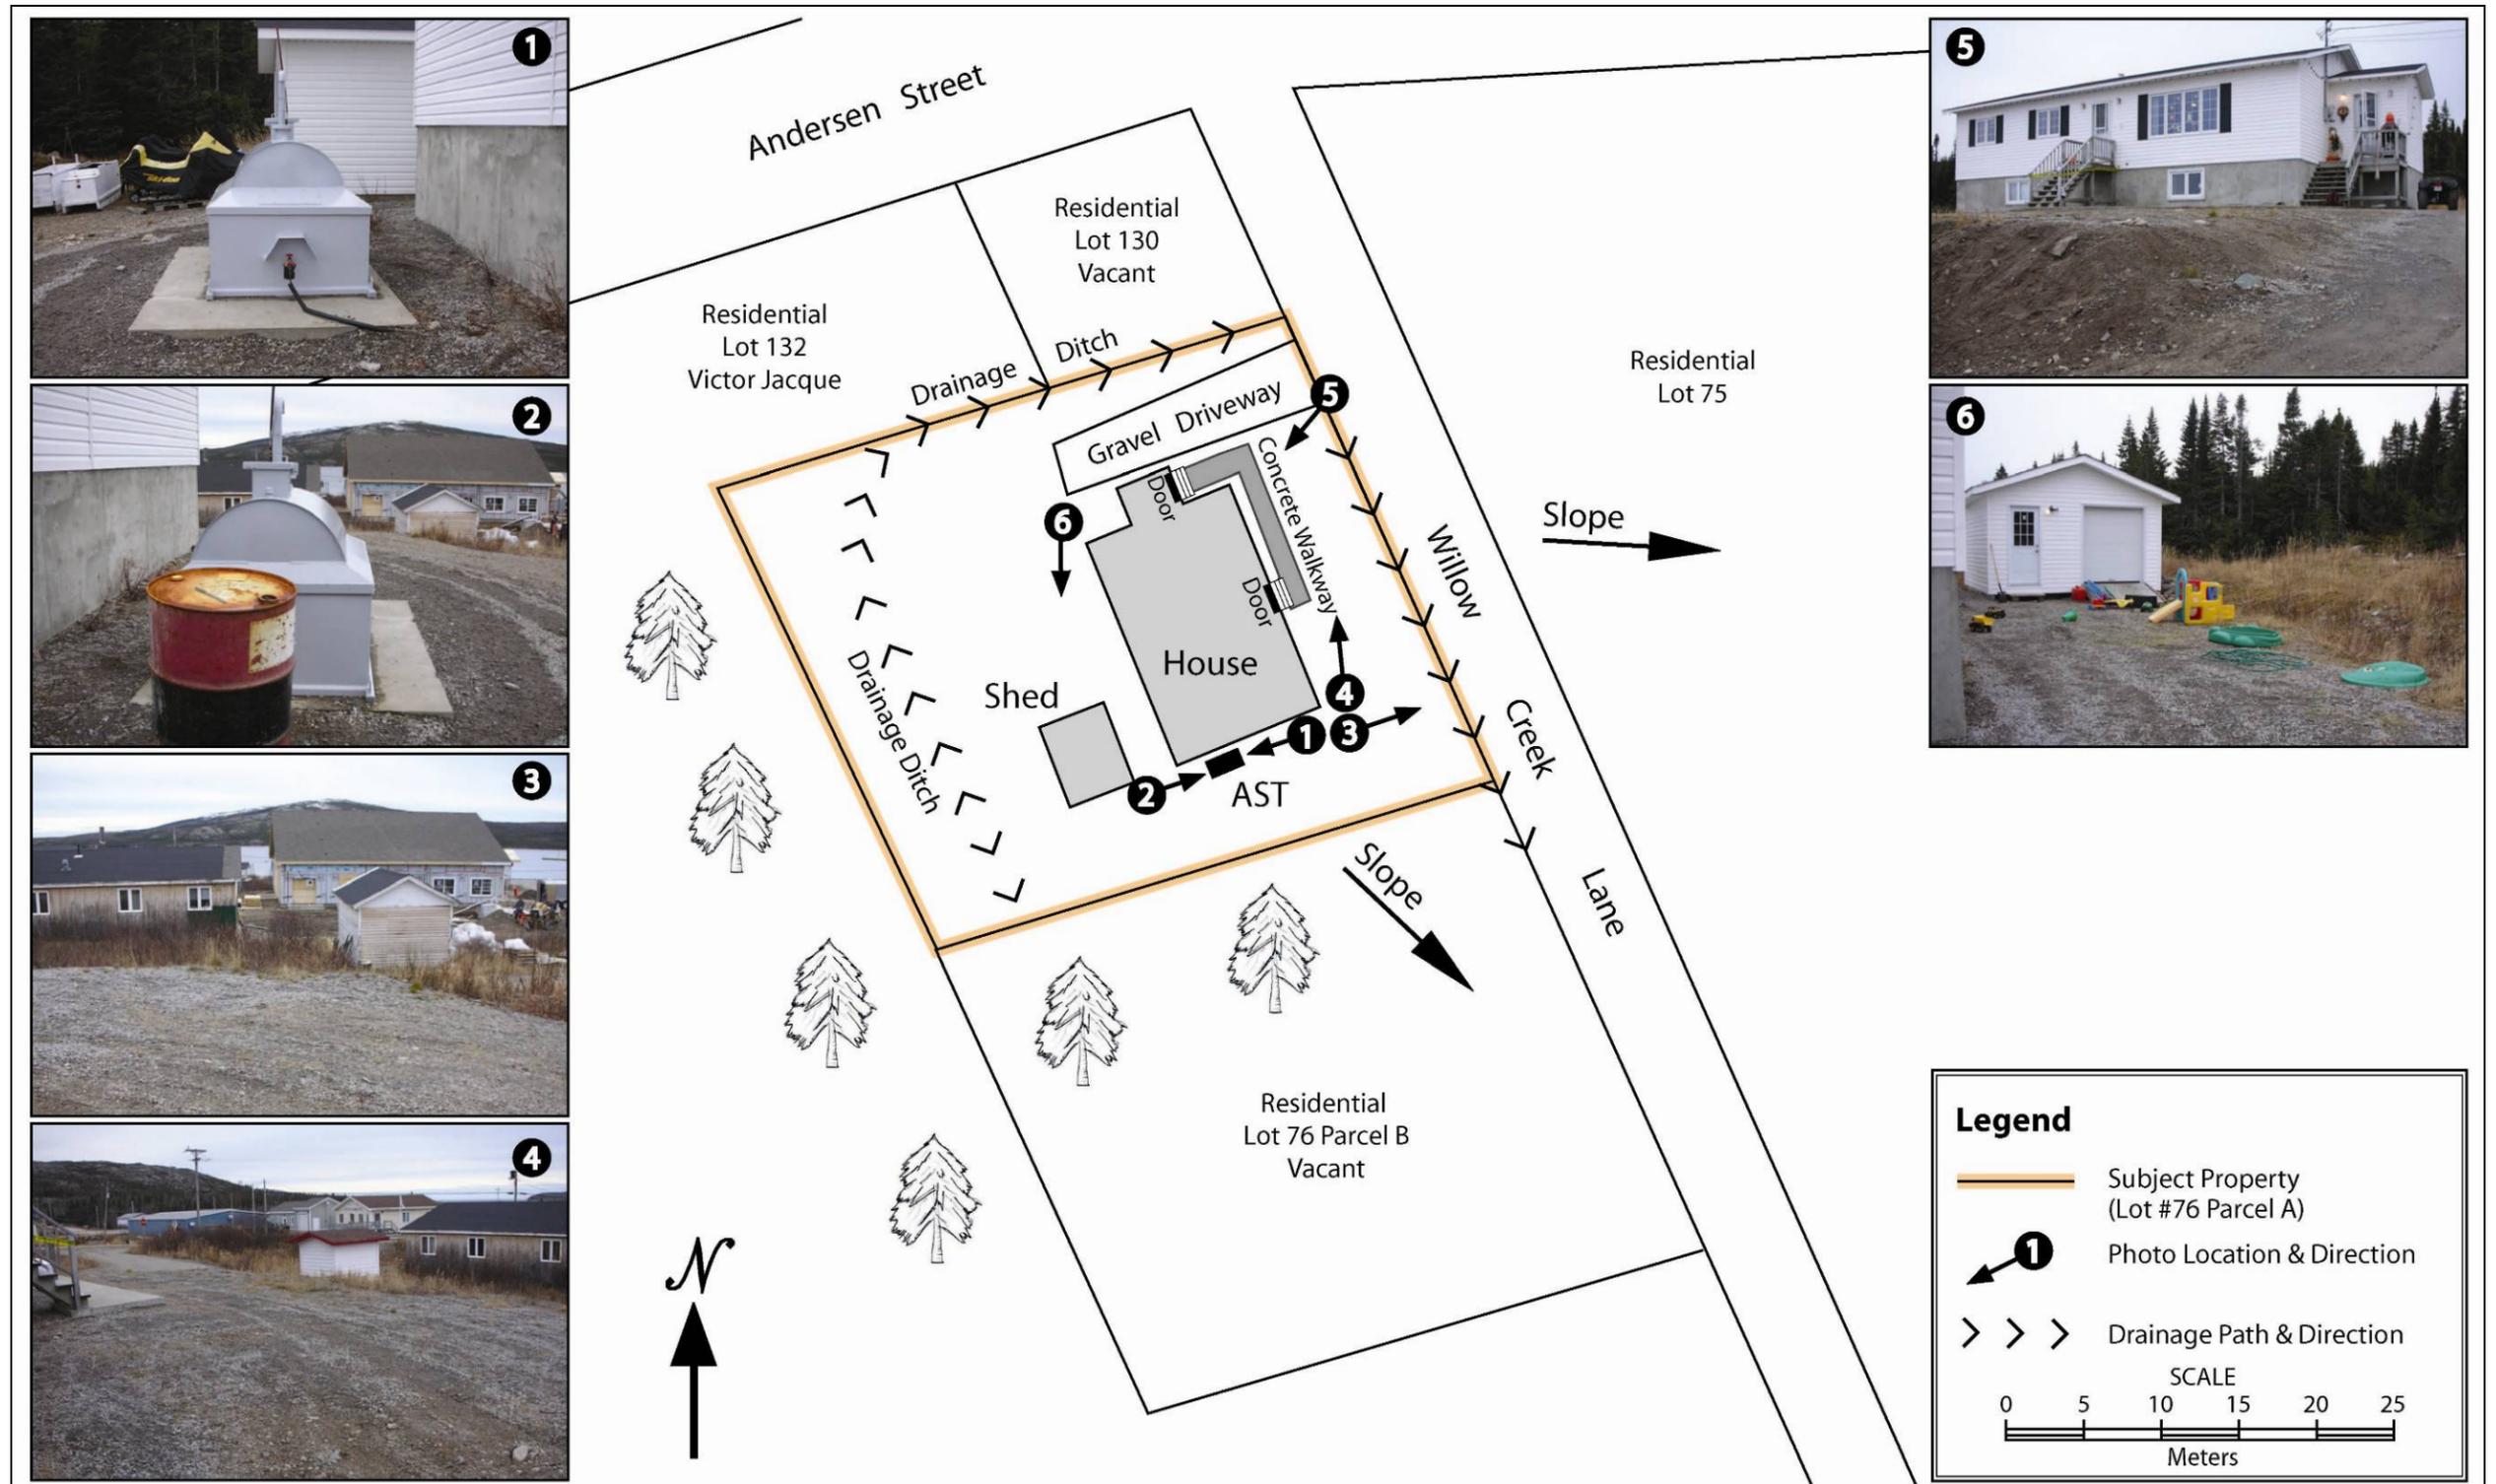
Married Quarters – 15 Andersen St. (Lot #76 Parcel A) Site Plan with Photographs
